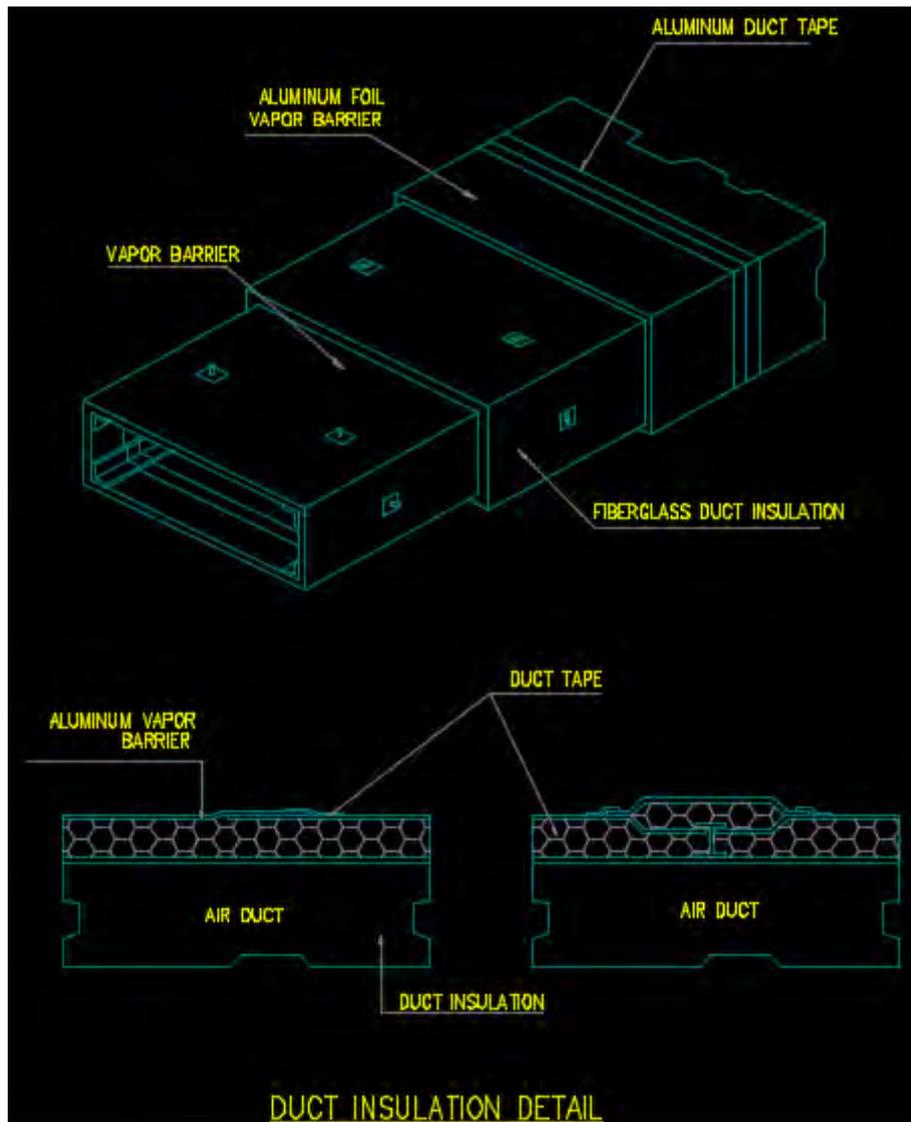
Details found in: hpkk-ukm\mechanical & electrical\cad file - mechanical\ACMV\Hospital\ MVAC-301,302-Typical Detail.dwg (old version).
